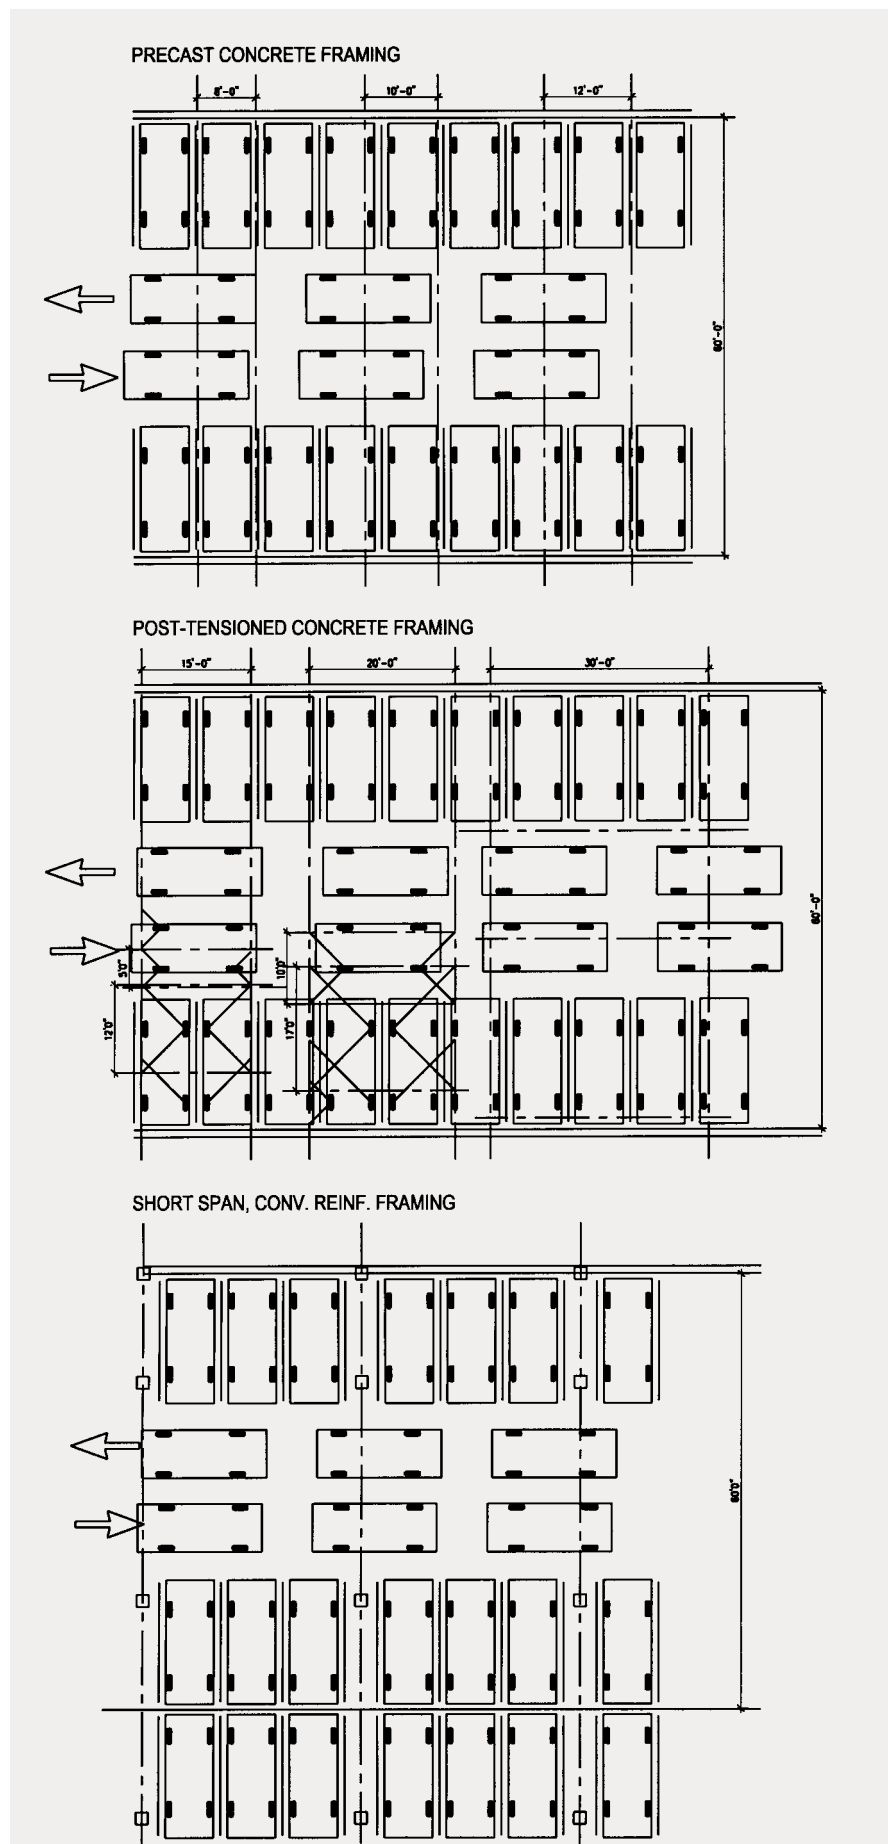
Typical parking layout (per structural systems used) for parking garages in the U.S.
